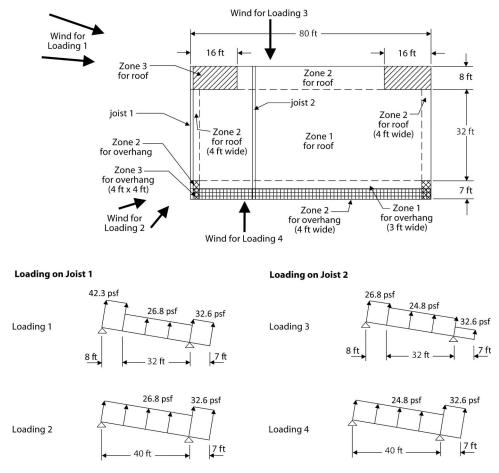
Design pressures for typical joists and pressure zones for roof components and cladding.
